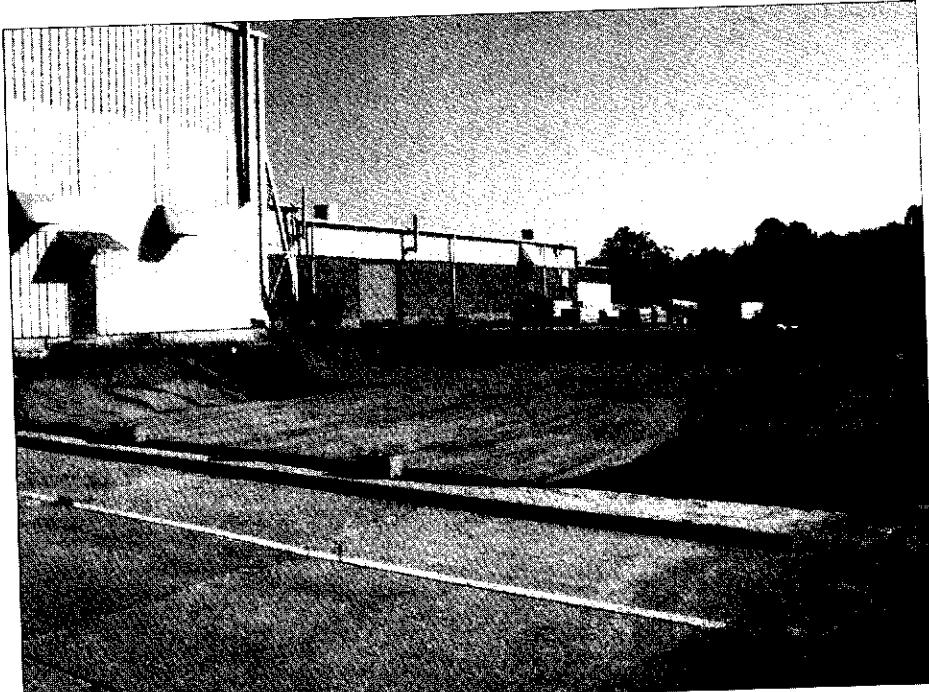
COMPLETED EXCAVATION WITH FIRST LIFT OF BACKFILL
